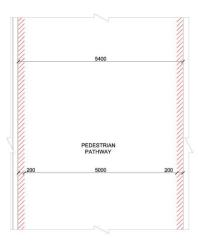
Street width and buffer spaces (in mm) for Gateway 8 in the area surrounding Luisenplatz in Darmstadt
